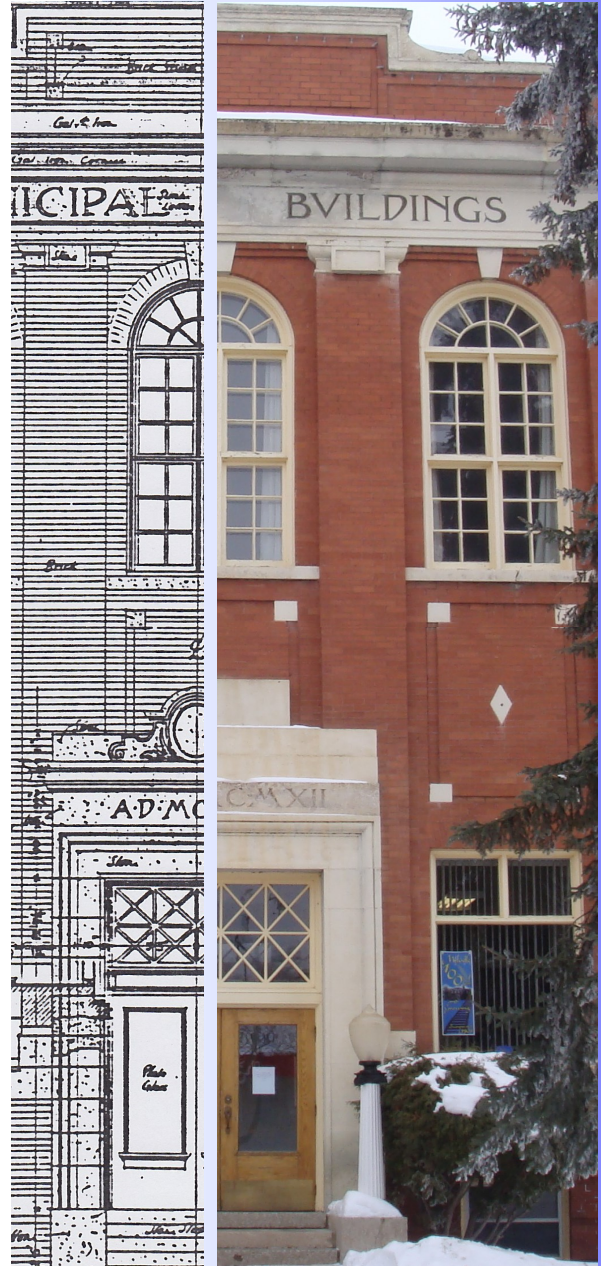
(above centre) - Partial original elevation, Storey & Van Egmond Architects (1912)
